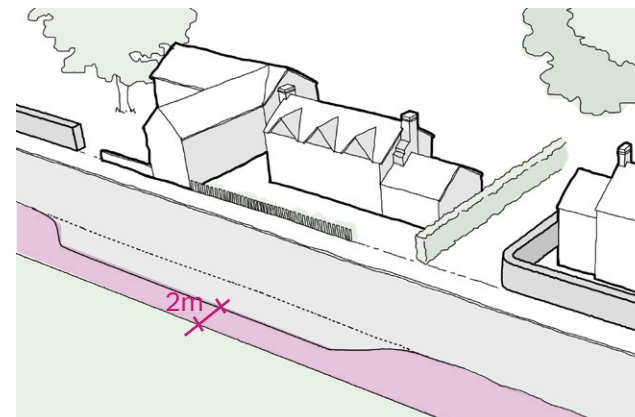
Ensure footways are minimum 2m width and on-street parking is integrated into footways.
